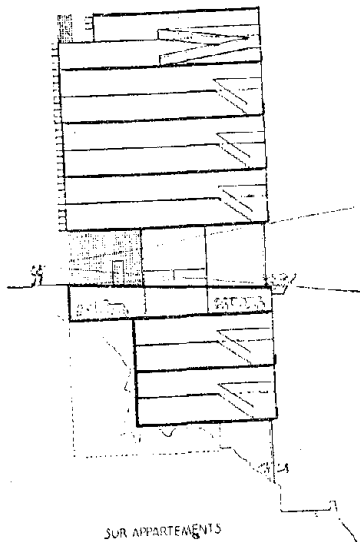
A sketch of the proposal that demonstrates the architect's intention of giving everyone a good view of the city by lifting the building off the ground on pilotis.
